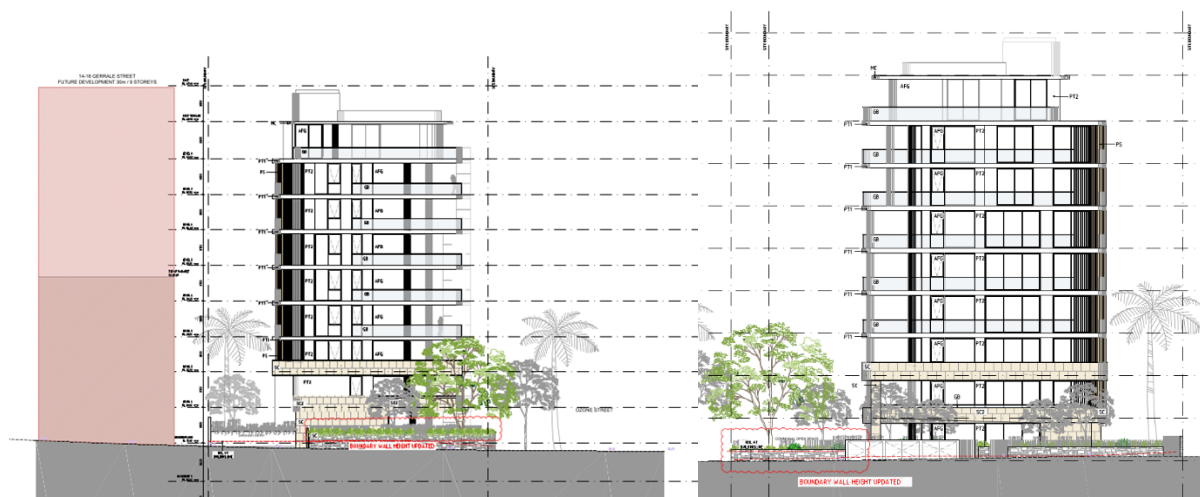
The approved fence/raised planter treatment along the Ozone Street elevation.
